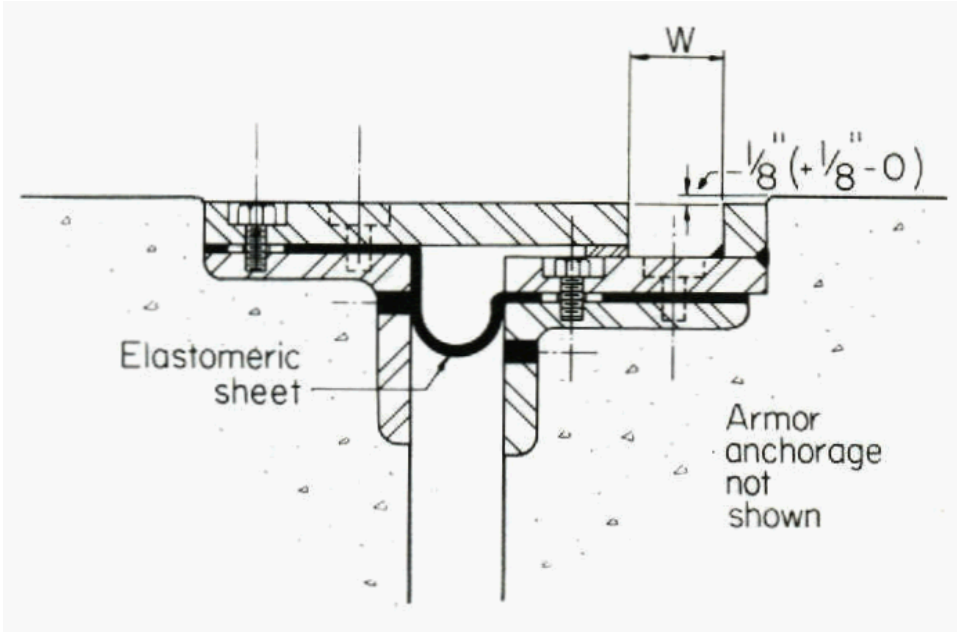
Cross Section of a Sliding Plate Joint
